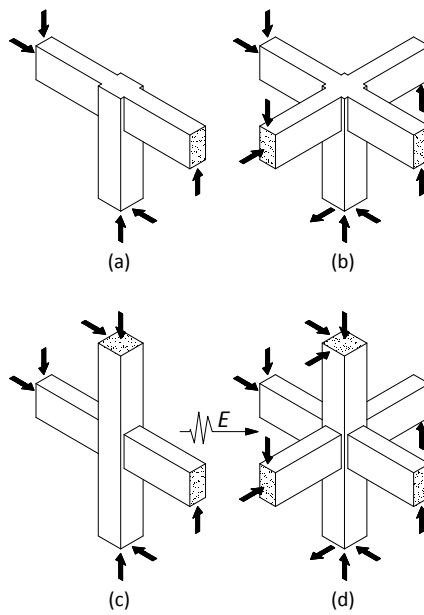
Interior beam-to-column joints (Paulay & Priestley, 1992).
